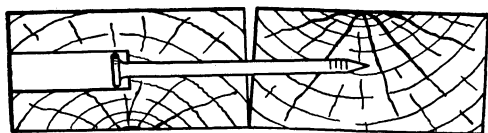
Cross section showing how two adjoining staves are spiked together.
